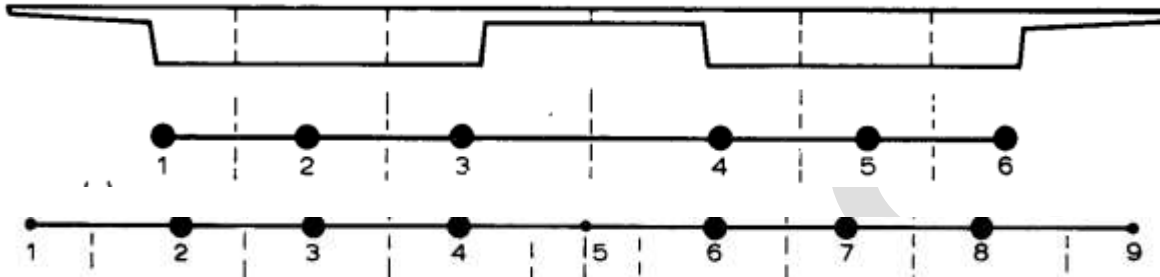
Alternative position for longitudinal grillage members for deck with thin cantilever and connecting slabs
